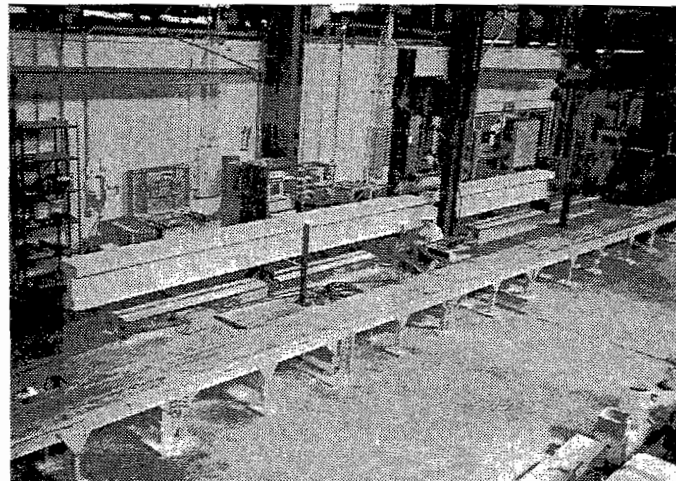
Photograph of Test Setup and Beam DB850-F1
